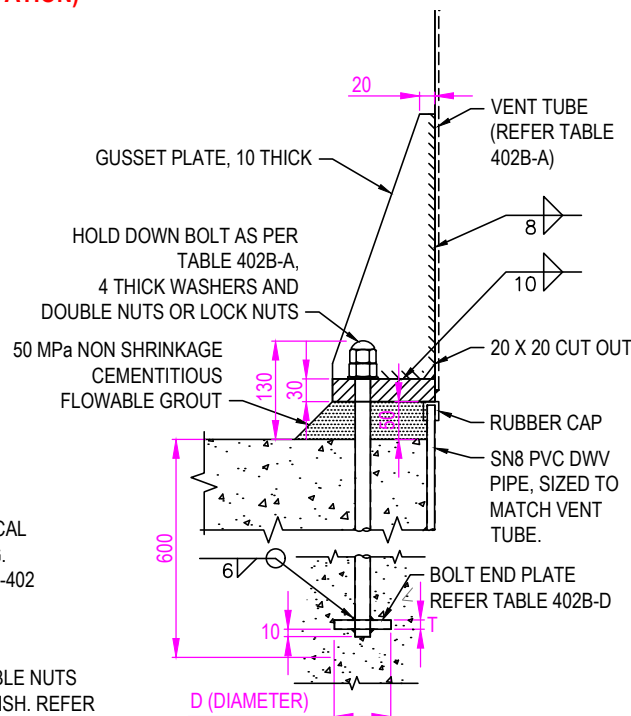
B-H: FLANGE MOUNTING DETAIL (ELEVATION)
